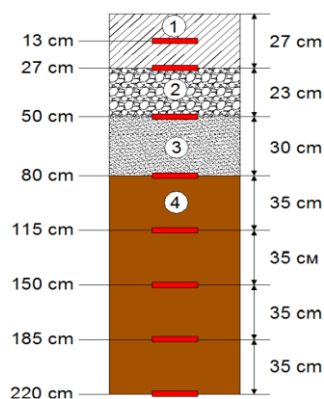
Scheme for location of sensors in pavement structure and subgrade for section with cement concrete pavement of “Astana-Burabai” highway: 1...3-numbers of pavement layers, 4-subgrade, ■-temperature and moisture sensors
